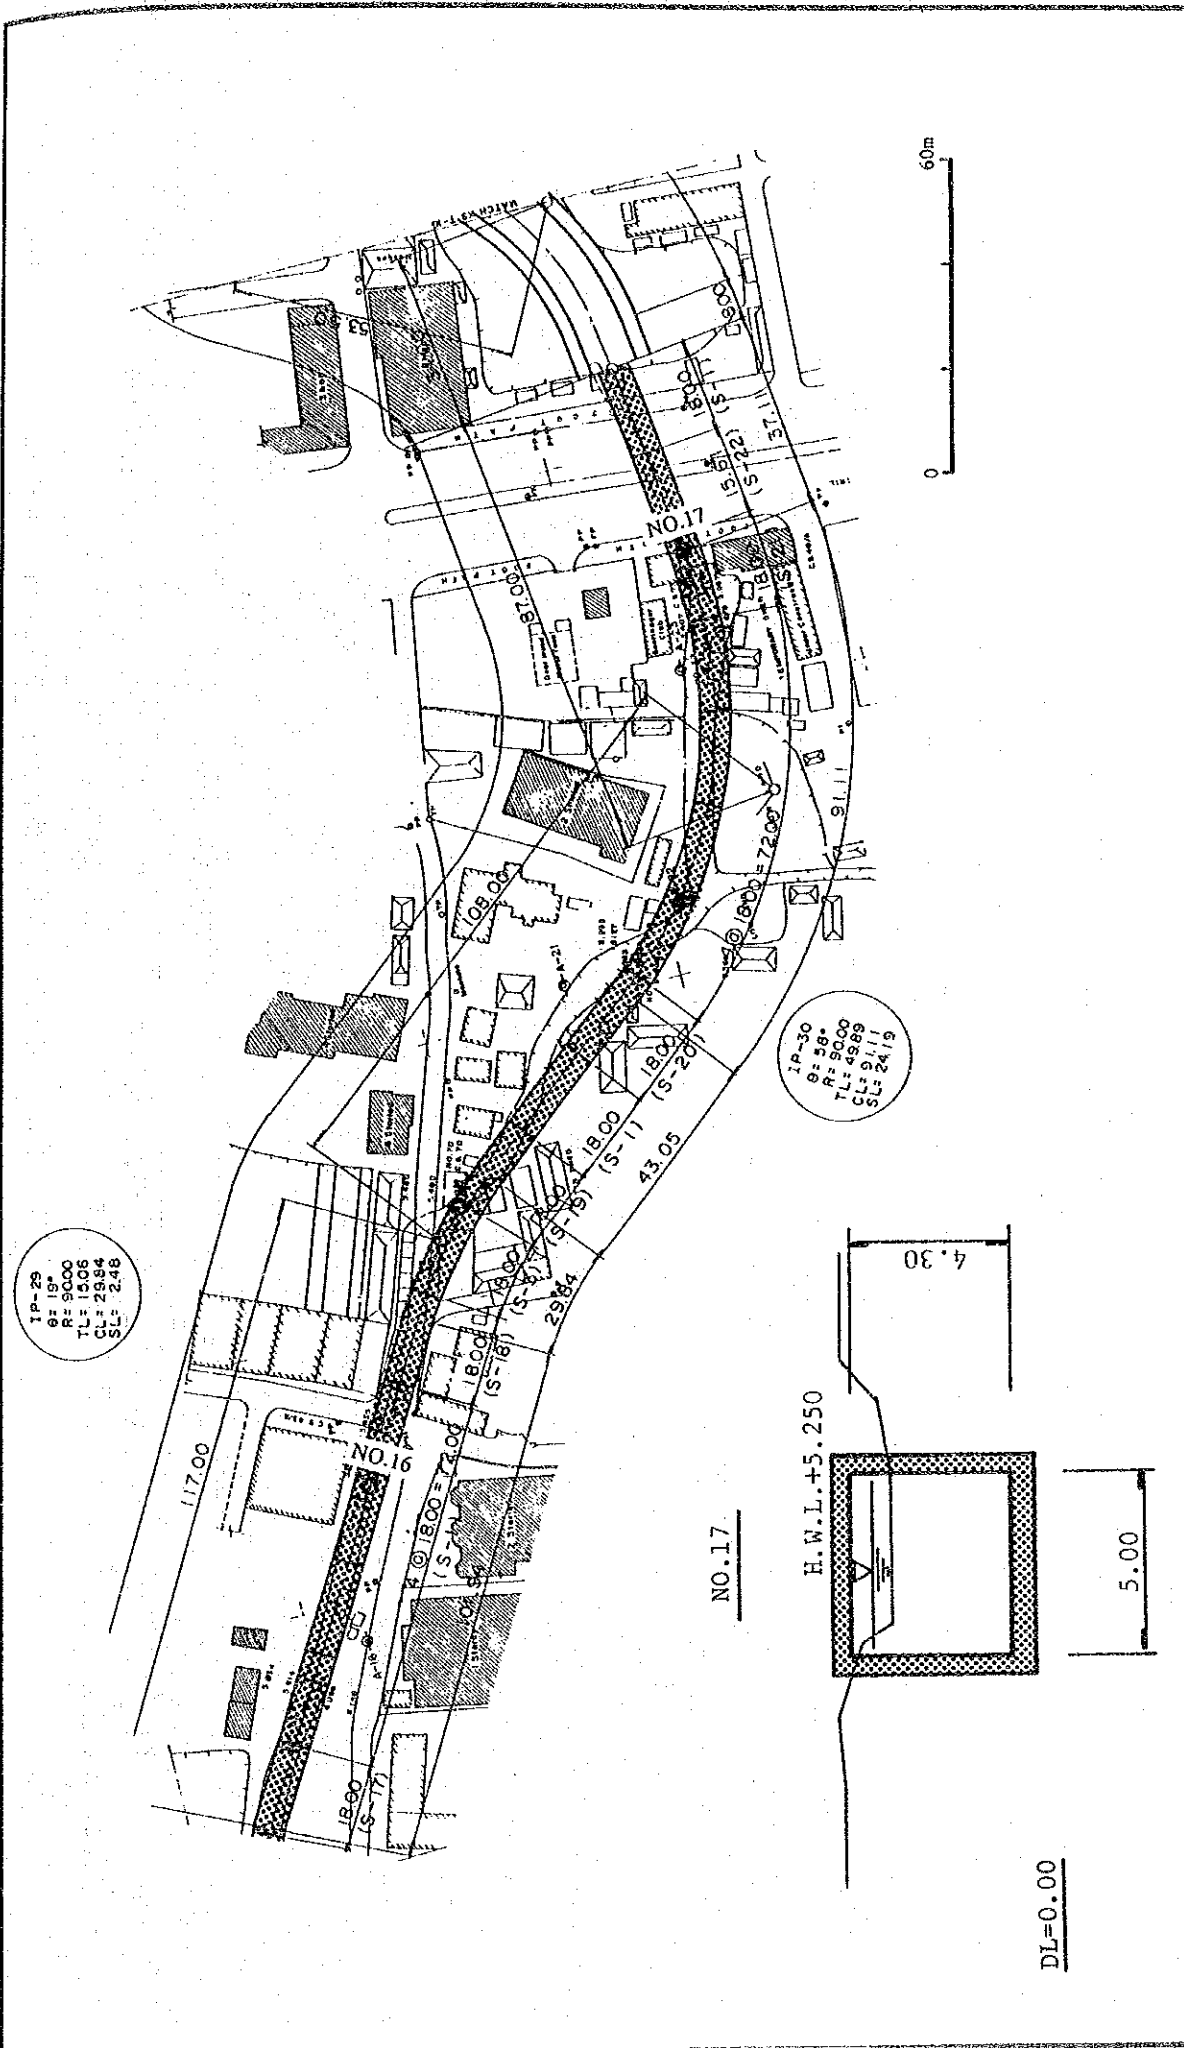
TYPICAL DESIGN OF KHAL IMPROVEMENT (3)
